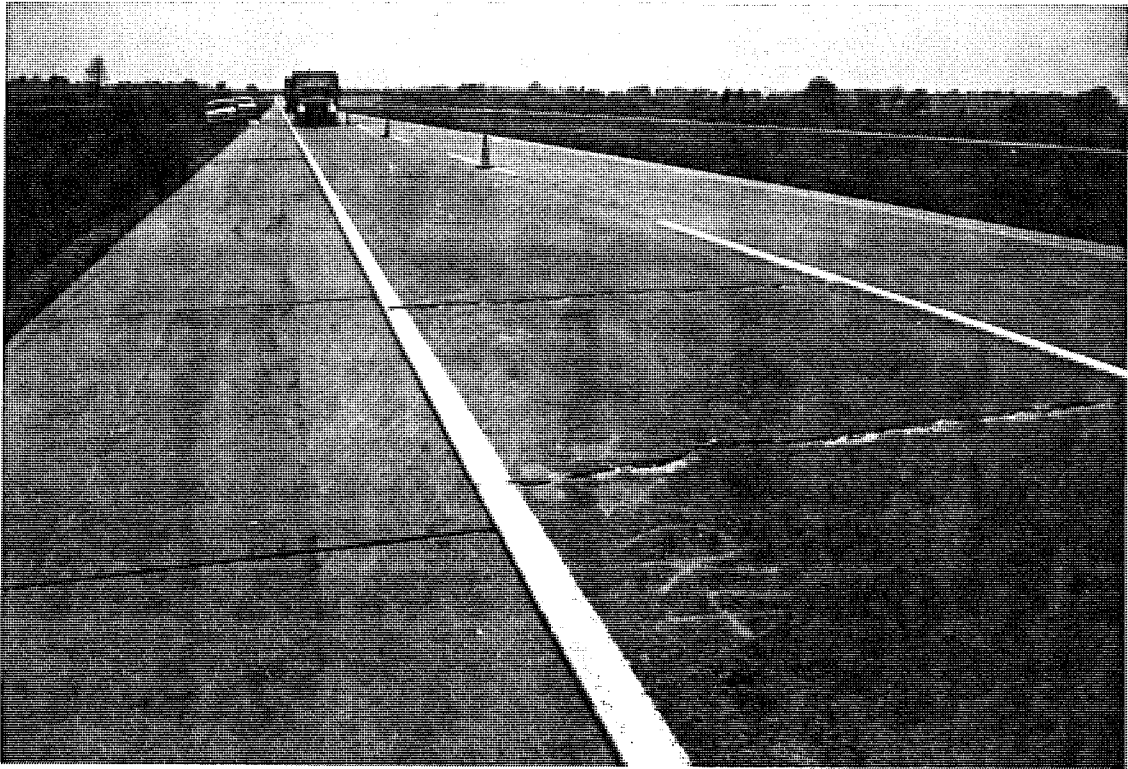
An overview of CSN# 77024-20821A (Section A), EB, showing severely spalled and faulted cracks at third point shoulder joints. The joint spacing in the driving lanes is 41 ft.
